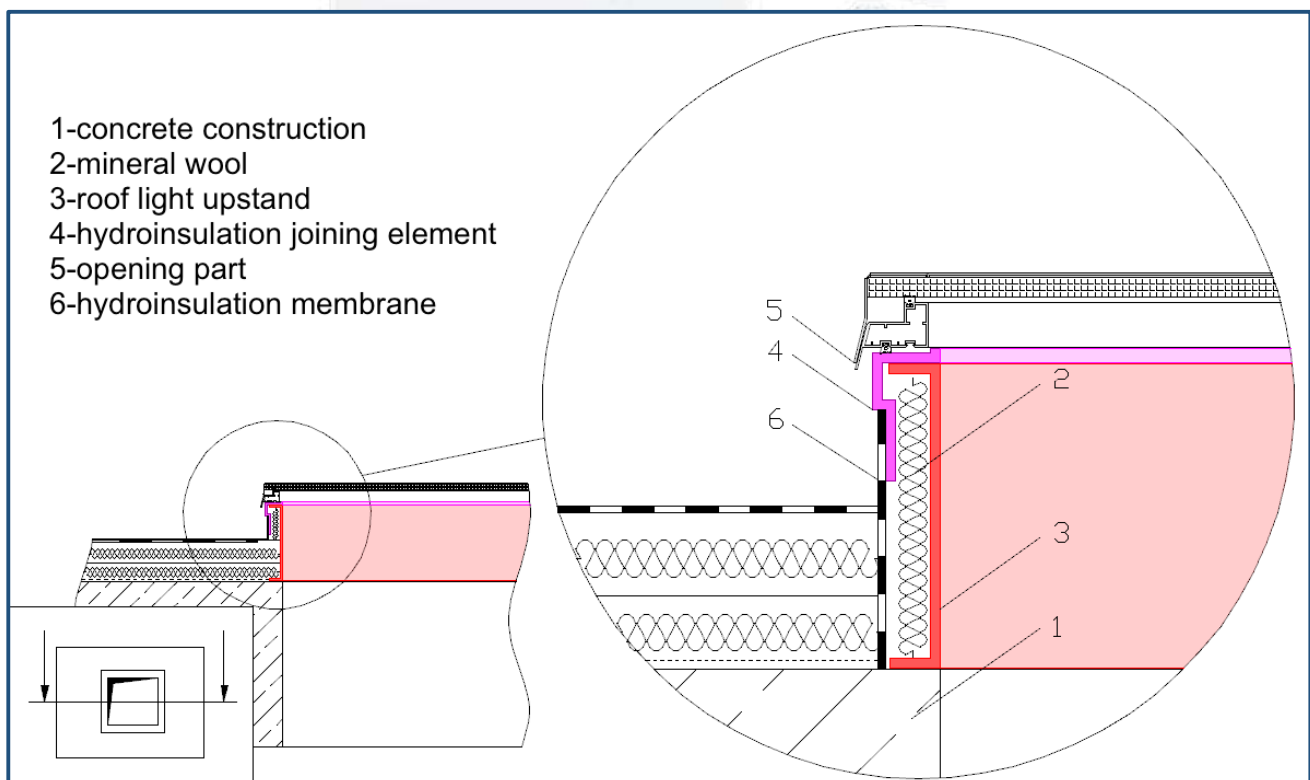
Installation scheme №3 - reinforced concrete roof/ base
